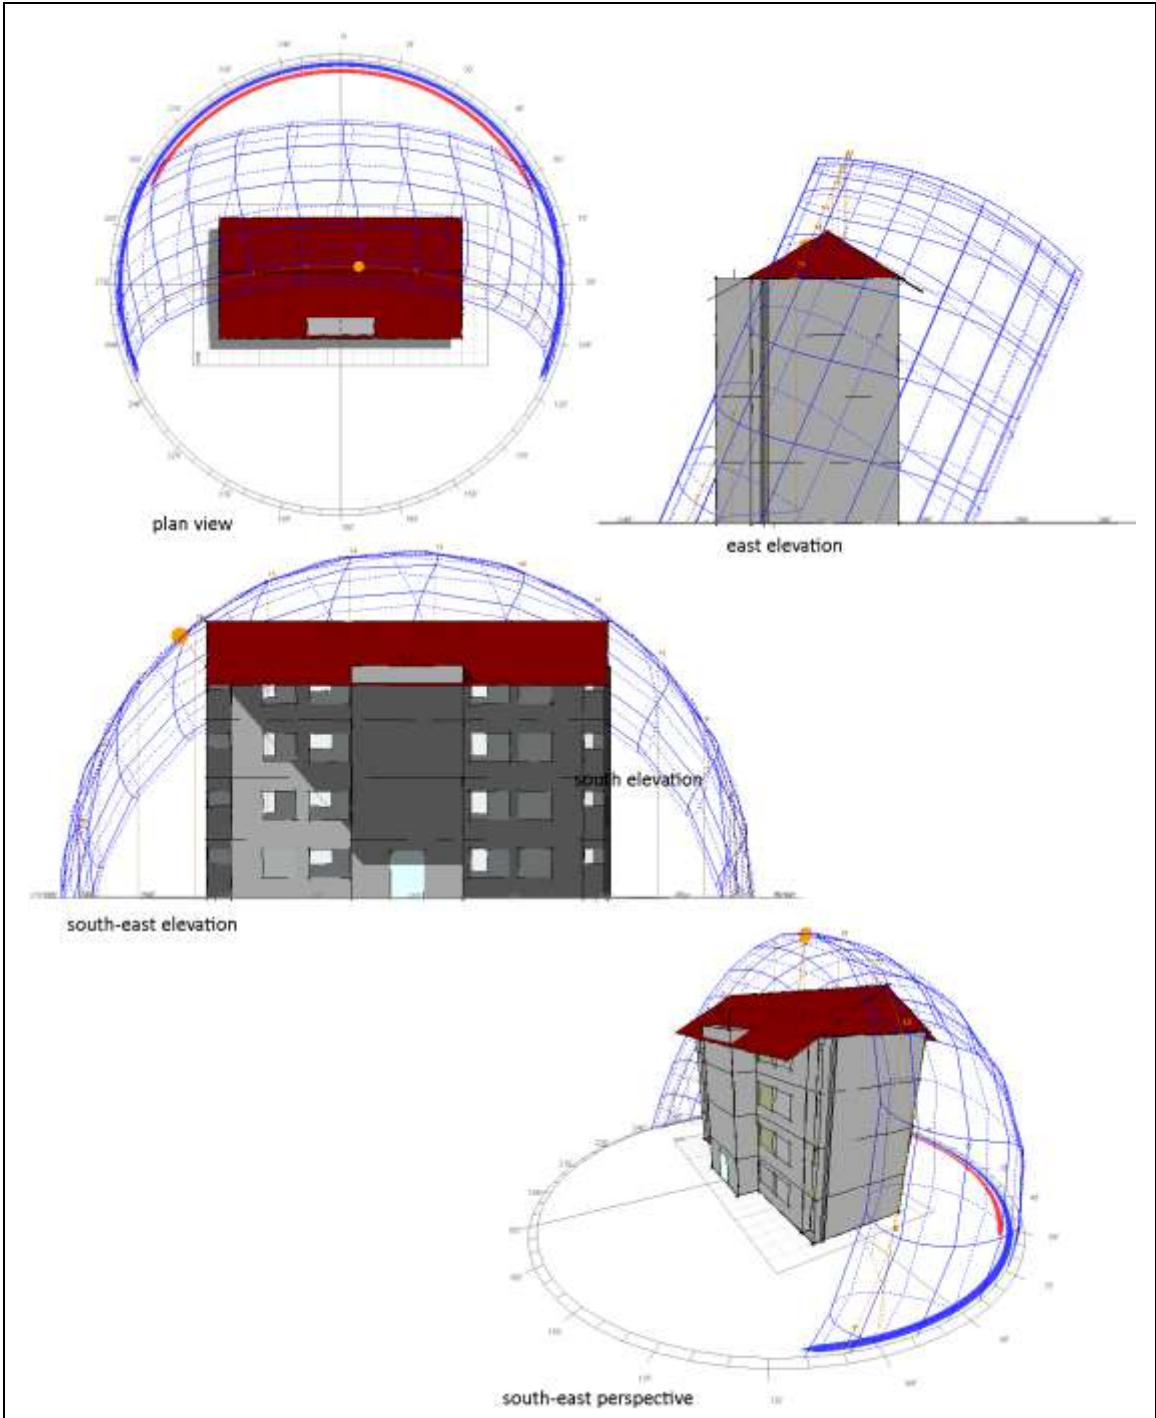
Voith building – extension south and north side of roof. Image source: Ecotect 5.5.
